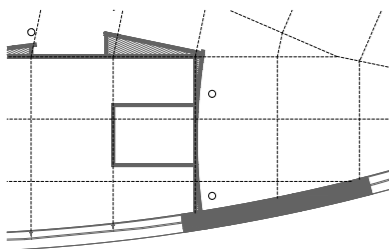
The floor is made of wide-slab prefabricated concrete elements (dotted lines). Their dimension is typically 3600 mm x 2733 mm.
